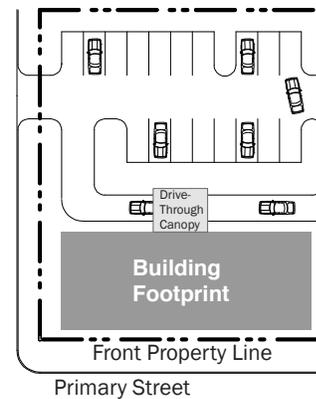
C (1). Recommended drive-through Facility layout.
